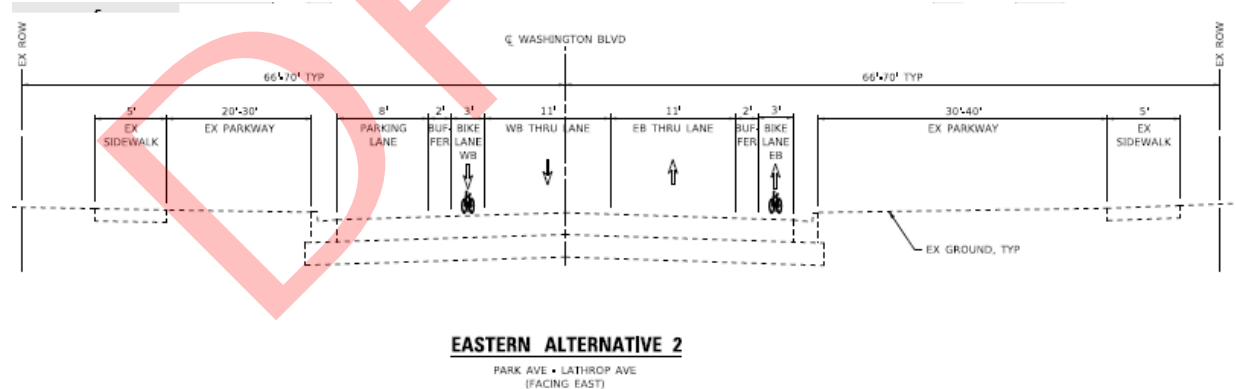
Eastern Typical Section Alternative 2 Washington Blvd.
